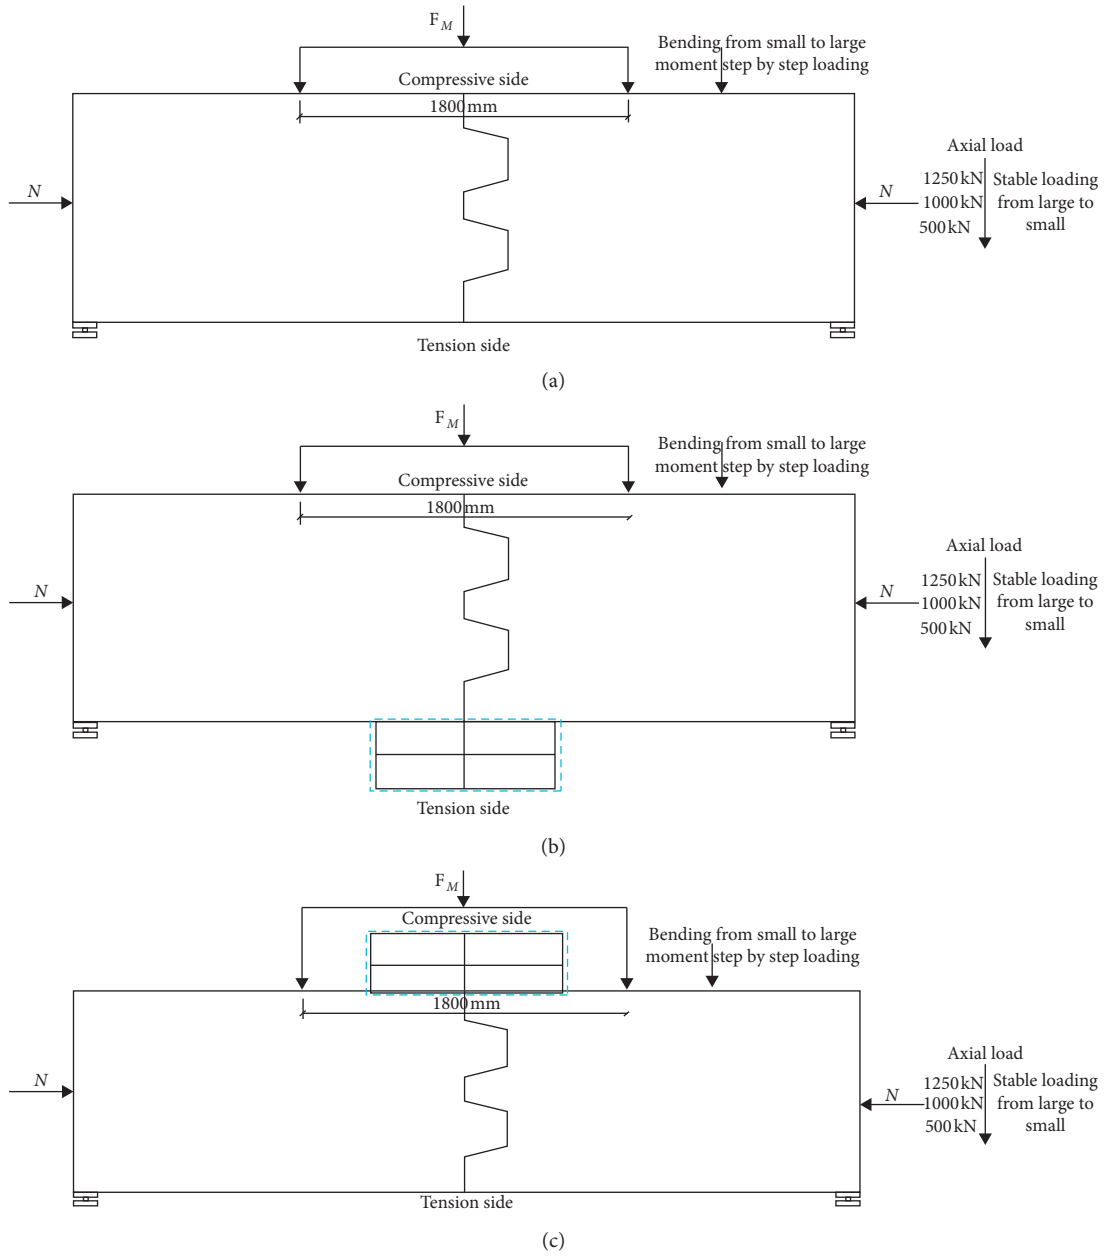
Layout for loading mode and sequence of specimens: (a) without auxiliary pretightening device; (b) auxiliary pretightening device on tension side; (c) auxiliary pretightening device on compression side.
